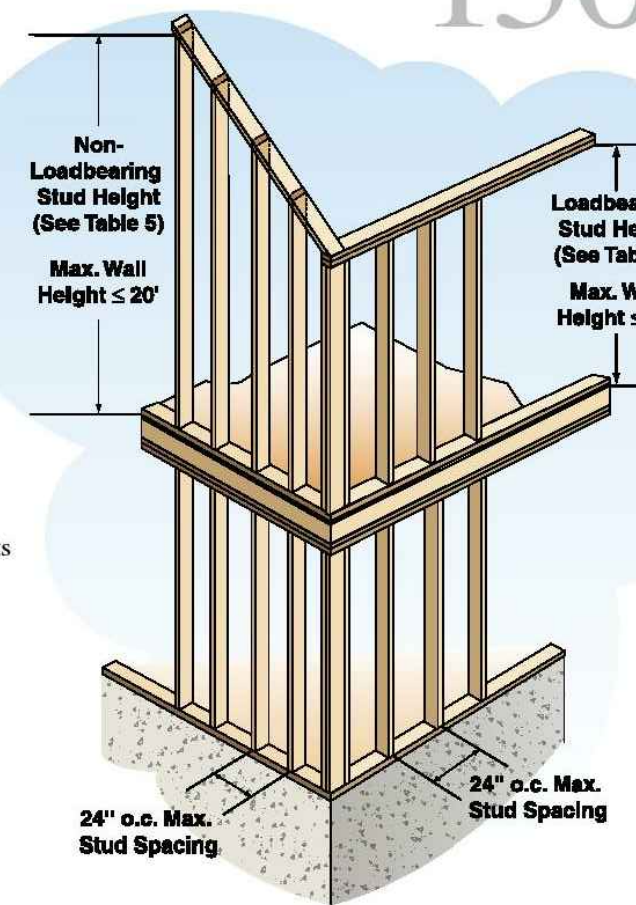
Maximum Wall and Stud Height and Stud Spacing
